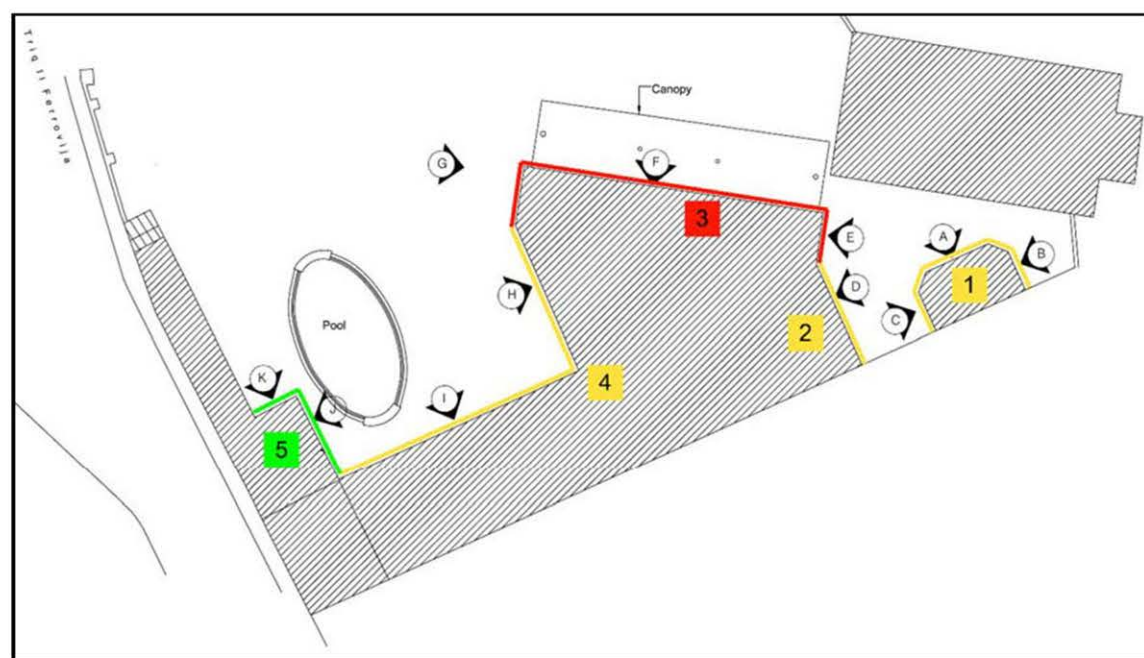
Block plan of Old Hamrun Central Railway Station indicating the notation of each elevation in letters, as indicated in the approved drawings of PA/07848/19, and colour coded elevations as per external finish type.
